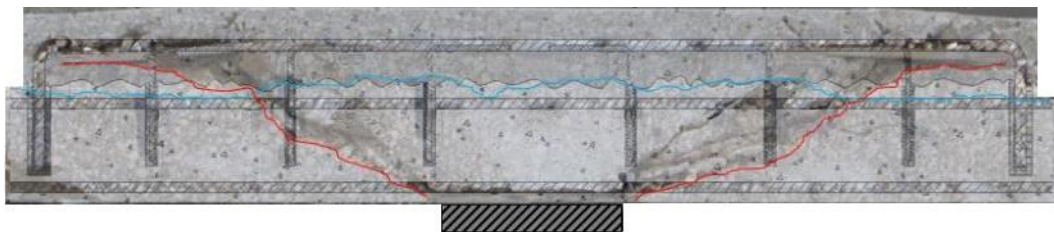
Sawcut detail of the  $S_{3D}$ -STANC specimen.
